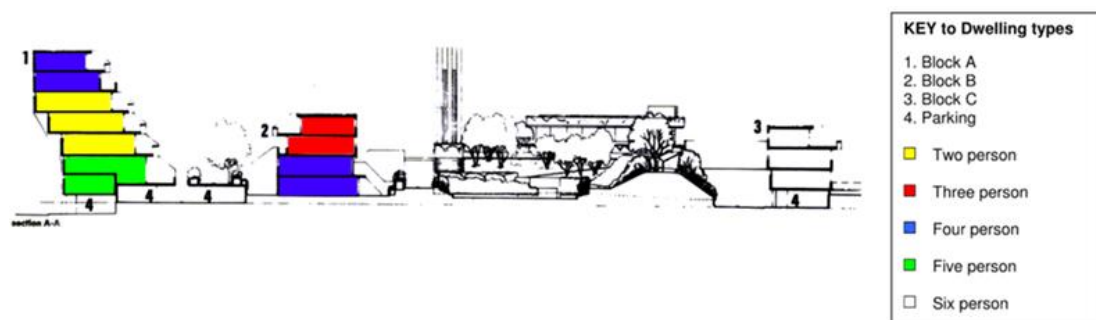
(above): Typical dwelling types within the Alexandra Road Estate
